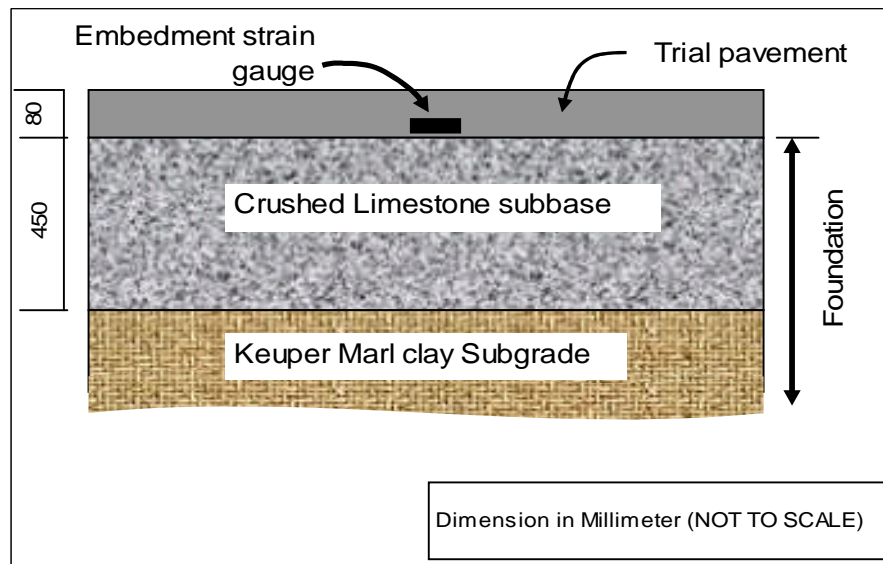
The trial pavement layer laid on top of the existing NPTF foundation
